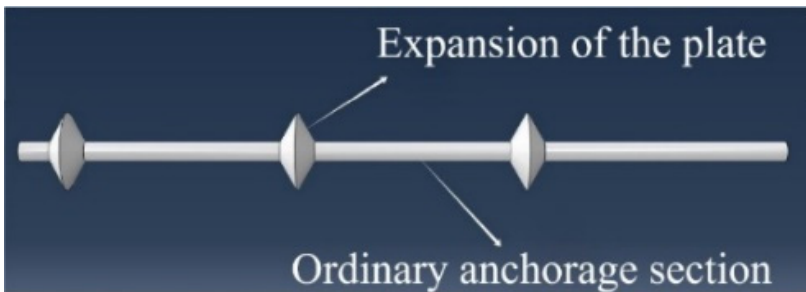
The schematic diagram of the anchorage section of expansion anchor rod
